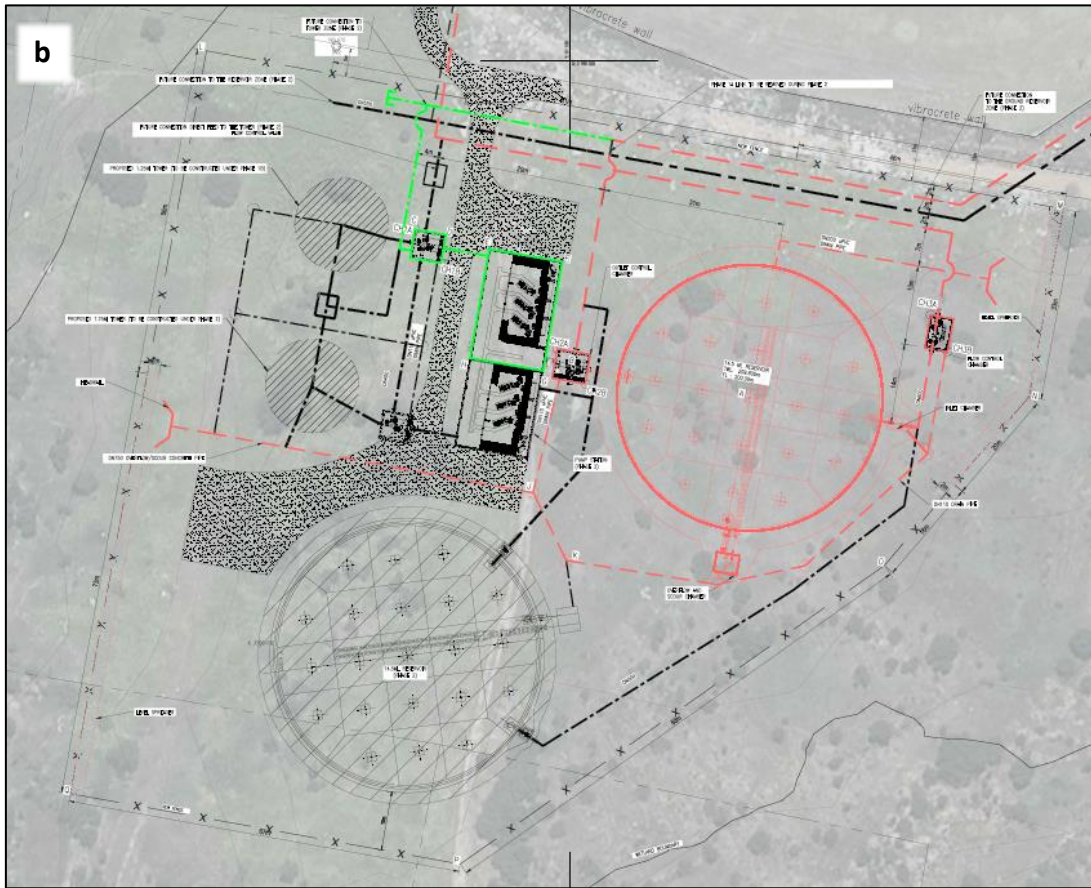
An extract of the Site Plan seen in 1a (zoomed out) and 1b (zoomed in) showing the proposed infrastructure.
